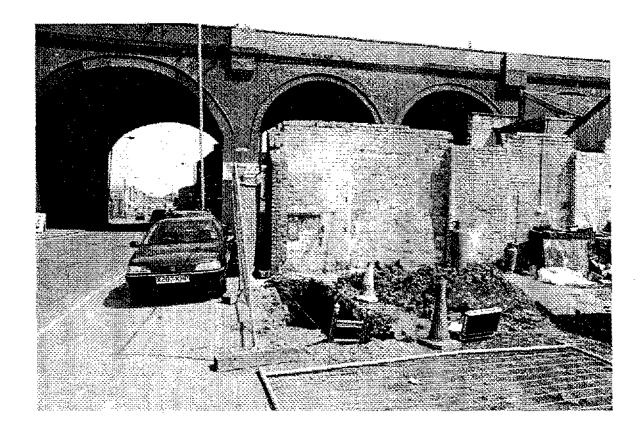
Trench 5. Looking towards northern boundary of Old Crown site.
